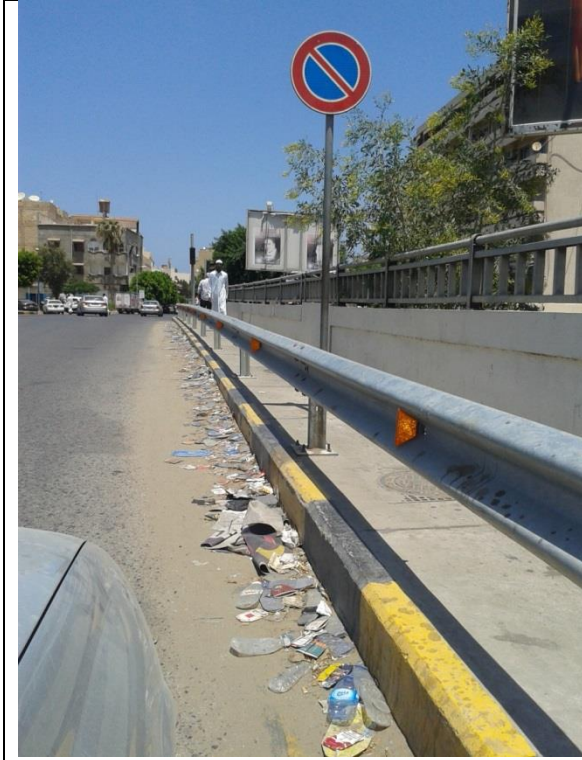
A general view of fences, curbs and Guardrail on the bridge
